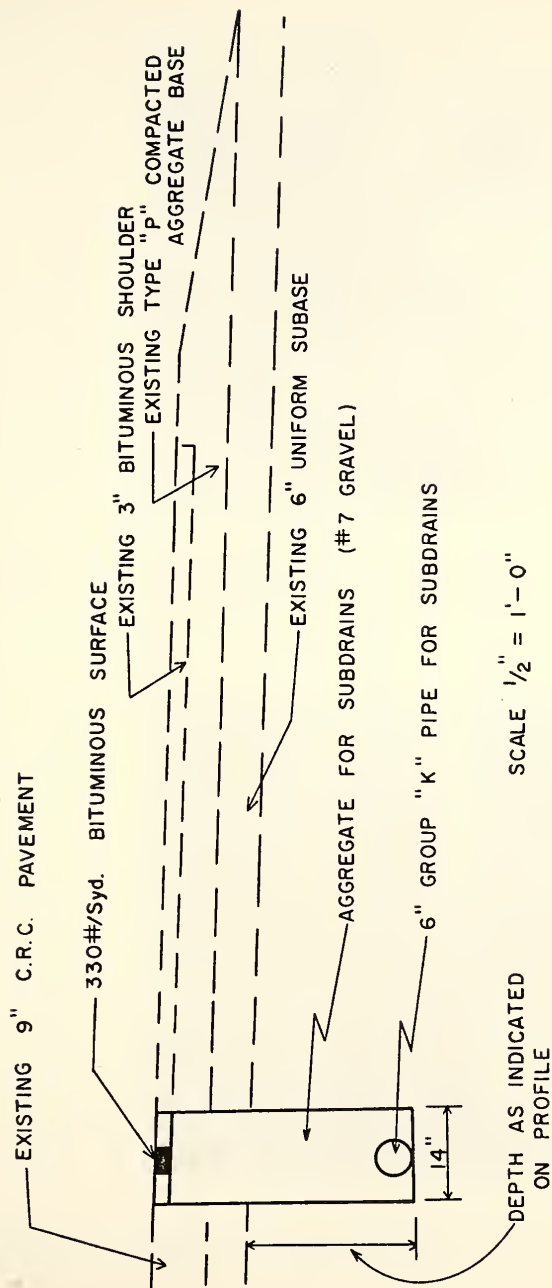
SUBDRAIN DETAILS ALONG OUTSIDE EDGE OF PAVEMENT
